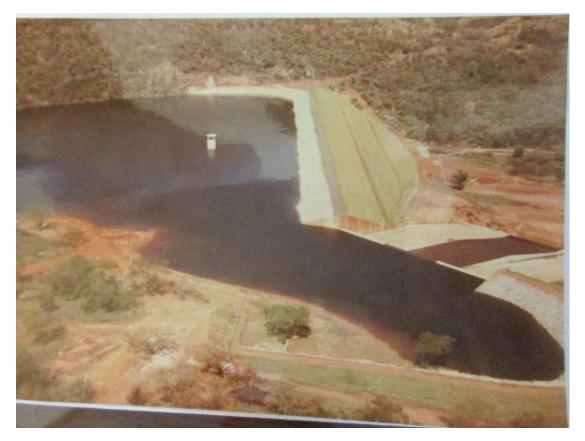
Upstream view of downstream face of dam wall after first filling Plate 6:- View from right bank after first filling
